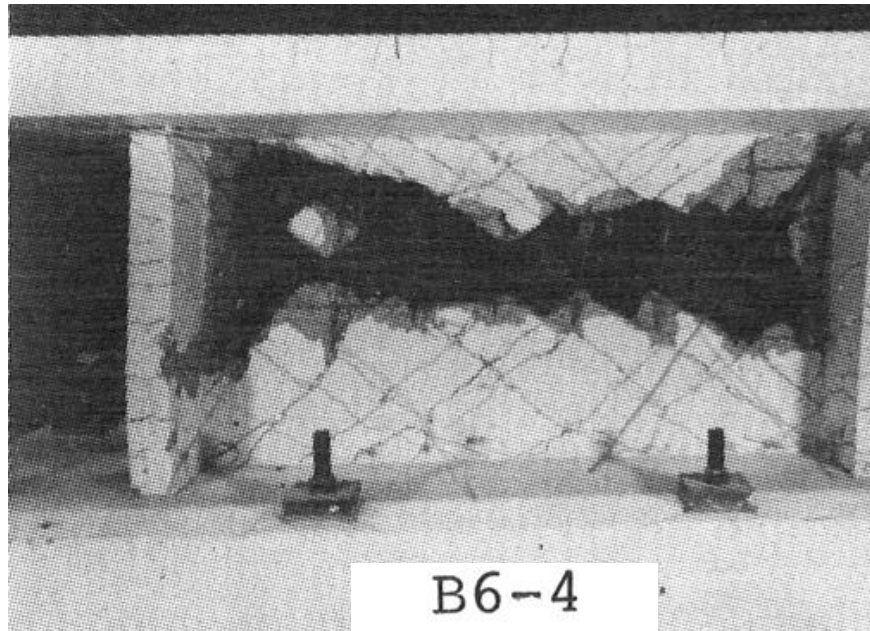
Specimen B6-4 at end of test (Bara et al. 1977)
